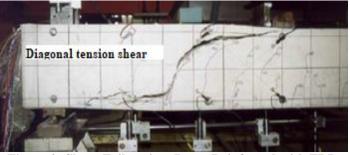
Shear Failure in a Beam Reinforced with FRP without Transverse Reinforcement
